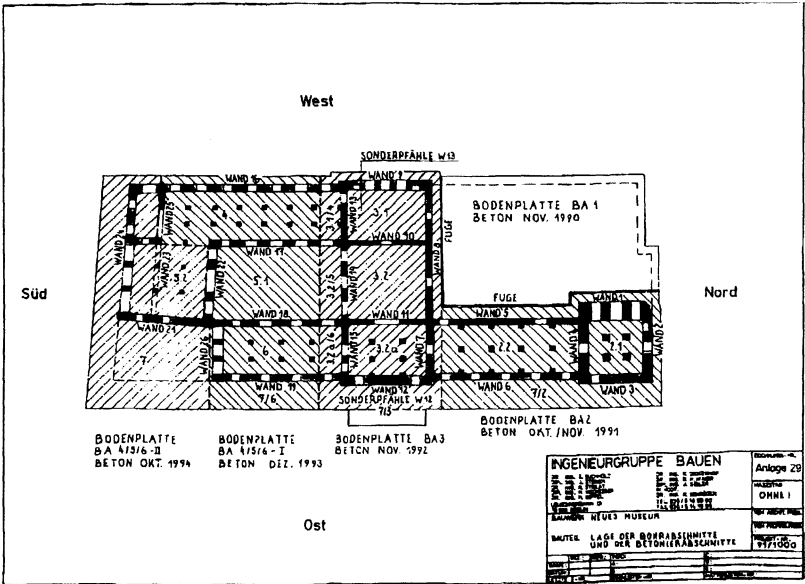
Ground plan of the remaining cellar walls Construction divisions
